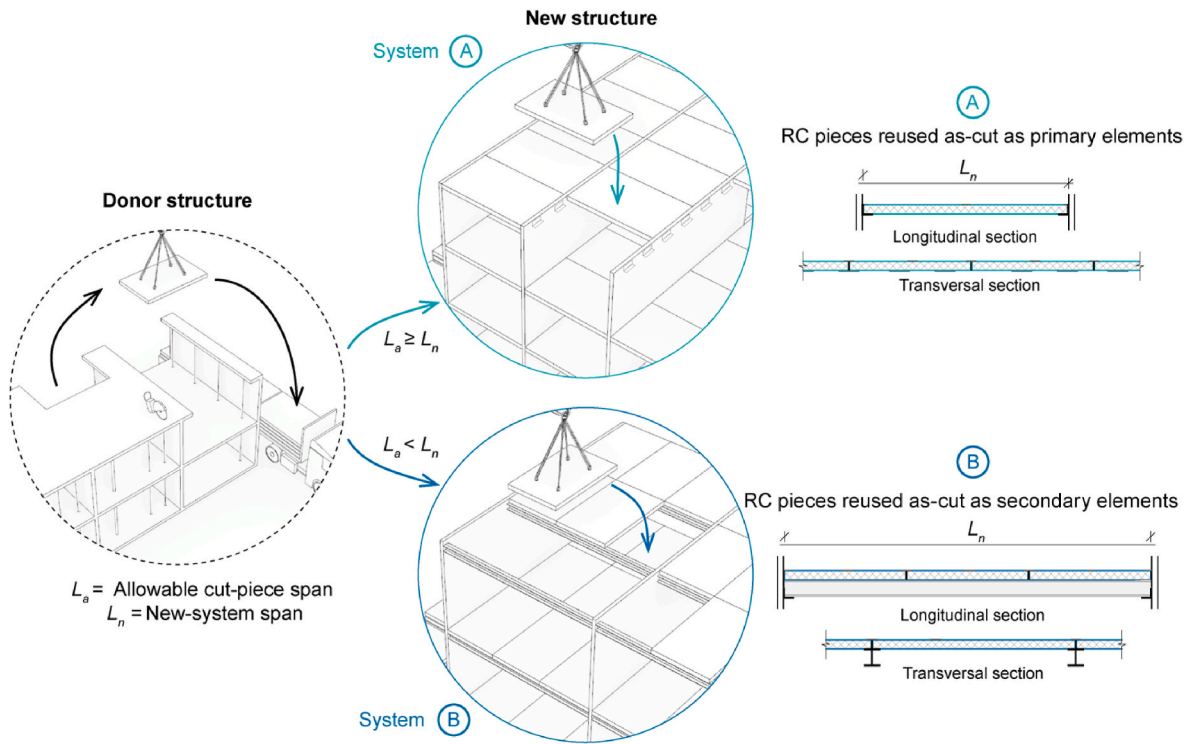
Concept of the reused RC floor systems: RC pieces are cut from existing buildings undergoing demolition and reused as primary (System A) or secondary (System B) elements in new building floors.
